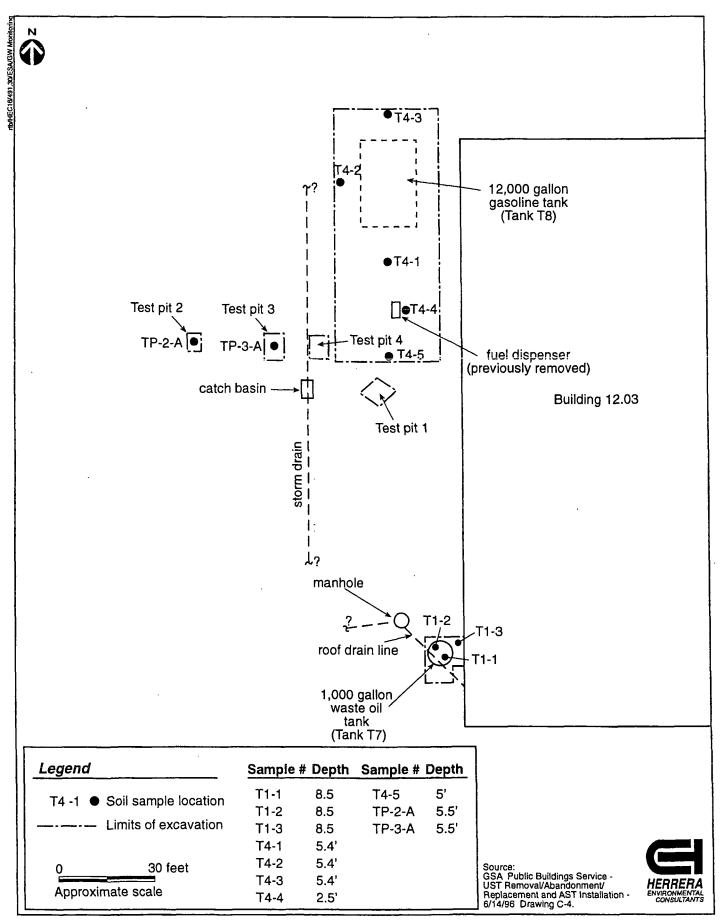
Former waste oil tank T7 and gasoline tank T8 location map, Building 12.03 at Federal Center South, Seattle, Washington.
